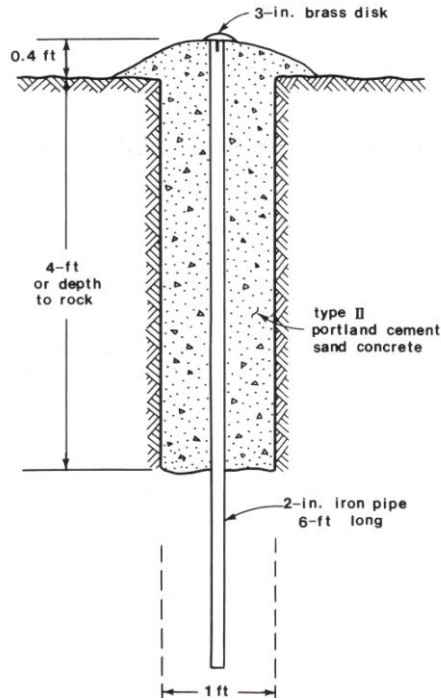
Monument constructed with concrete and rebar (O'Rourke et al., 1982)
